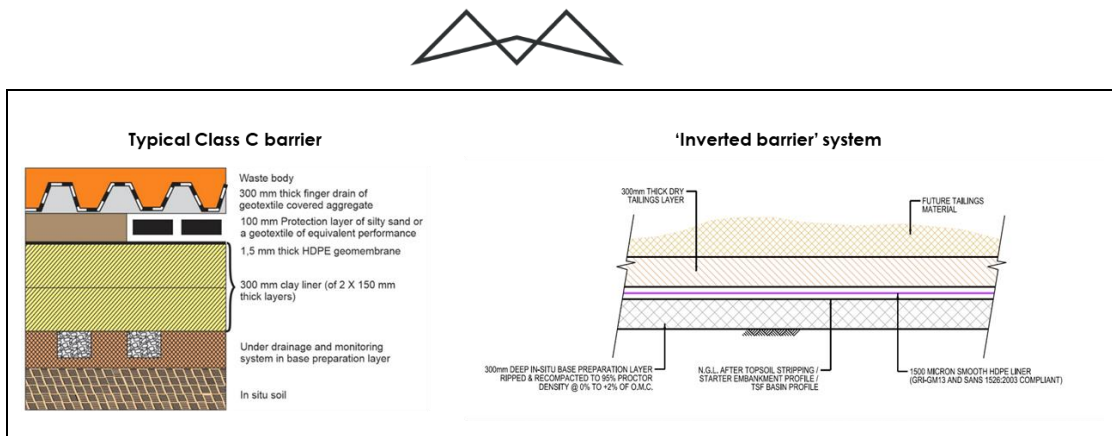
TSF Inverted Liner system proposed for technology alternative 2.
